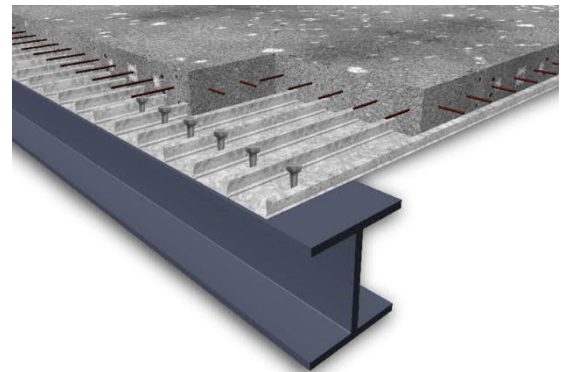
Reinforced Concrete Platform with Mezzanine Deck
